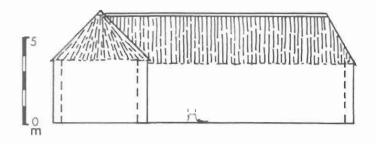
Cross section of Schreuderhuis with its pitched roof and newly erected tail in c.1730. A floor hearth may initially have been in use against the back of the clay wall of the lean-to.
